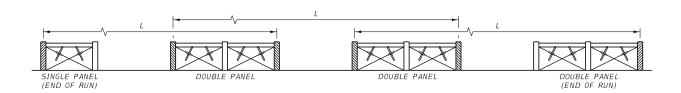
DETAILED DRAWING REFERENCE DWG. NO. STANDARD SPEC. SECTION 607 607-05 FENCE DETAILS
